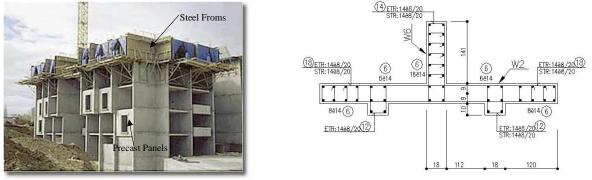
a) A Tunnel Form Building under construction, b) Reinforcement detailing of walls in a typical Tunnel Form Building
